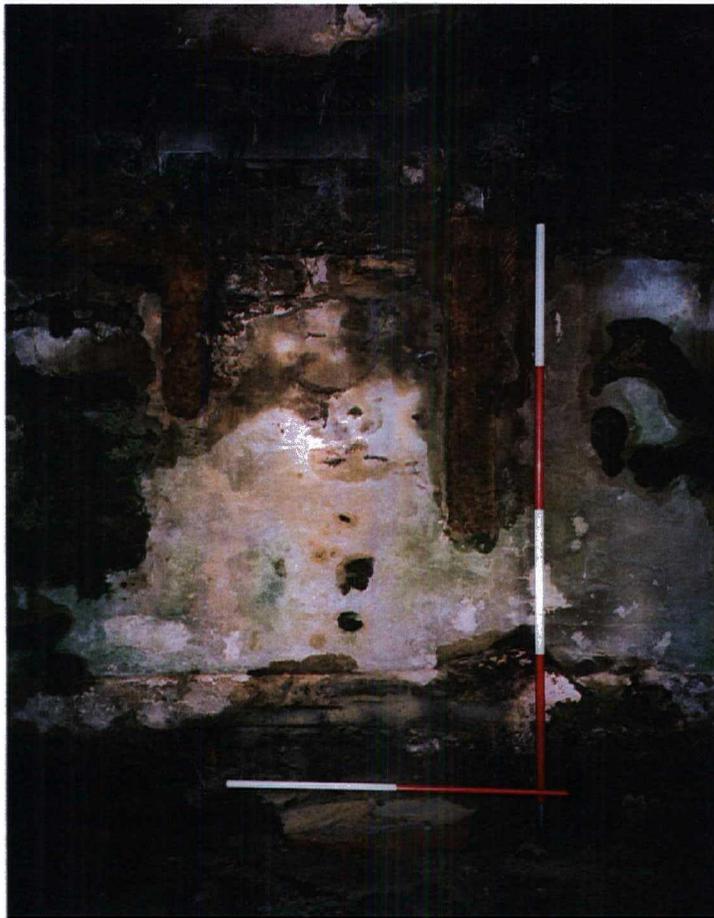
Brackenridge OF. Blocked door in north wall, with jambs of softer yellow sandstone which occurs randomly elsewhere in the building..
